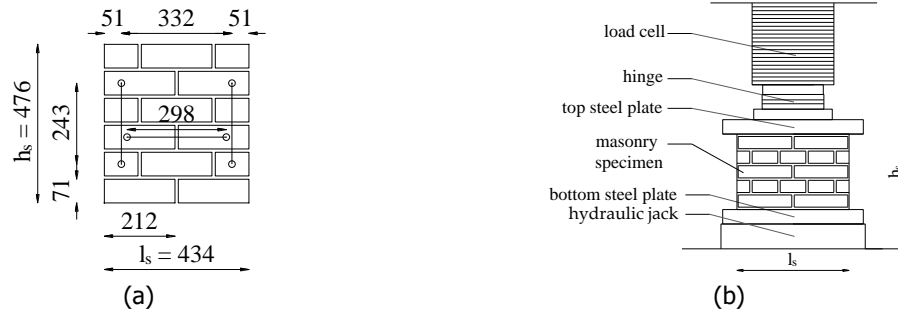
(a) Dimensions of the calcium silicate brick masonry wallets; (b) compression test set-up.
